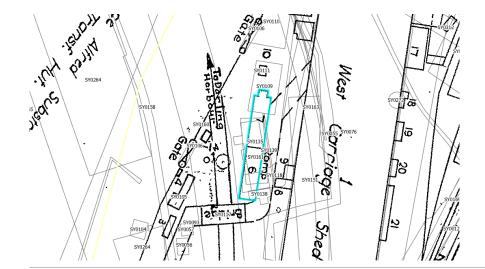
1953 lighting plan of Sydney Yard. Source: Sydney Trains Virtual Plan Room.
